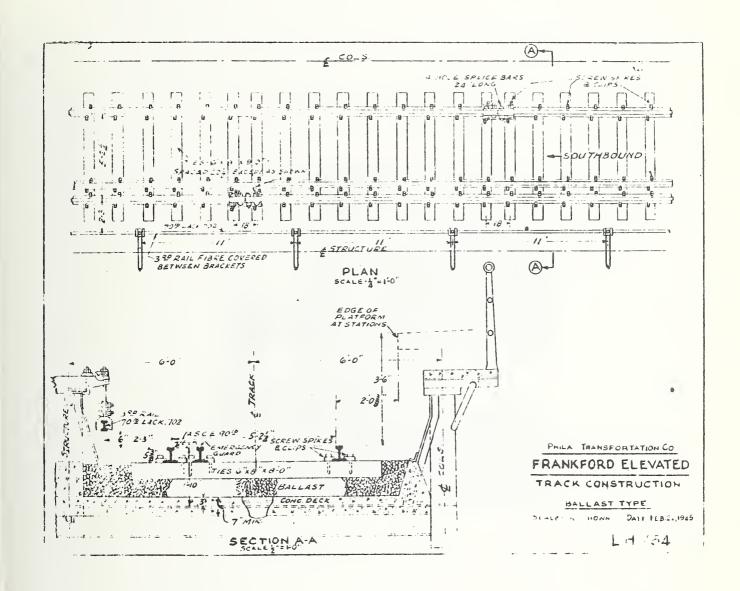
SEPTA FRANKFORD LINE ELEVATED STEEL STRUCTURE TRACK CONSTRUCTION
